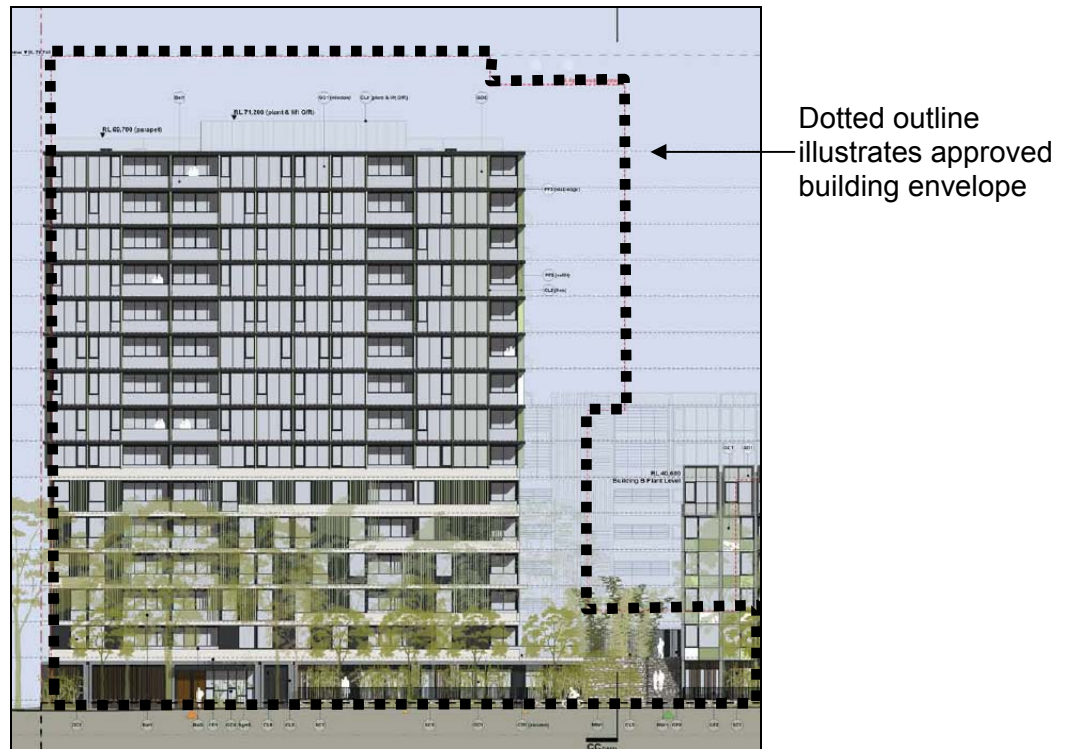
The reduced envelope and floorplate of Building A from that approved in the previous DA scheme
